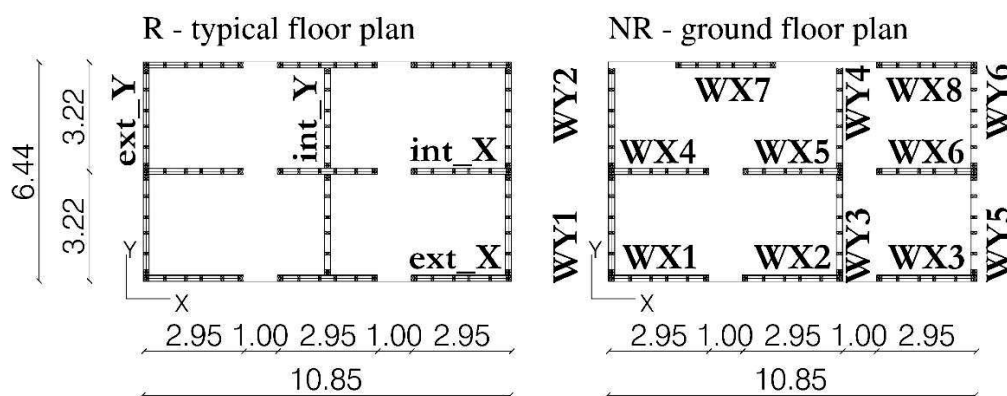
Labelling of LFT walls for regular and non-regular buildings.
